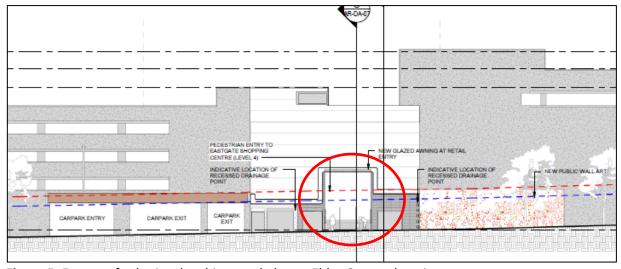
Extract of submitted architectural plans – Ebley Street elevation
